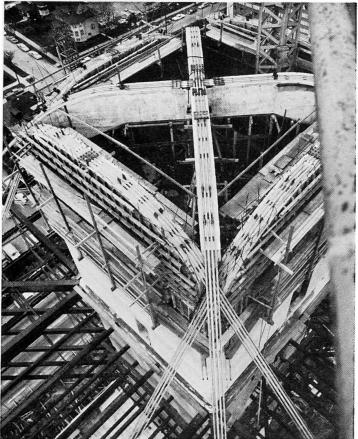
Six Sets of Continuous Cables Supported on a Centre Core
